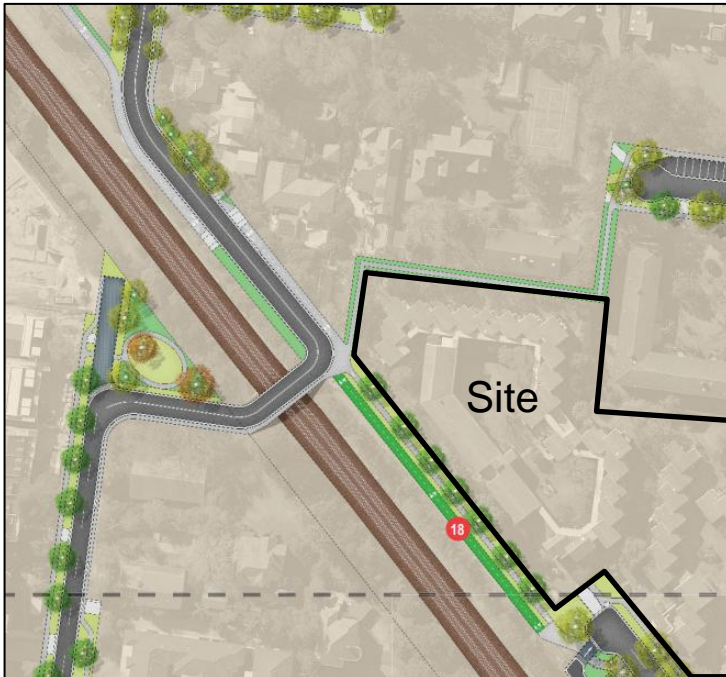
Turramurra Public Domain Plan (Rohini St cul-de-sac)
